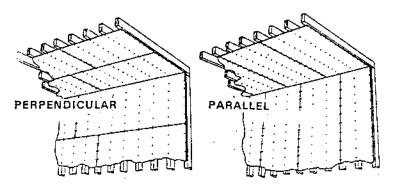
Horizontal and vertical application of wallboard to wood-framed construction.
